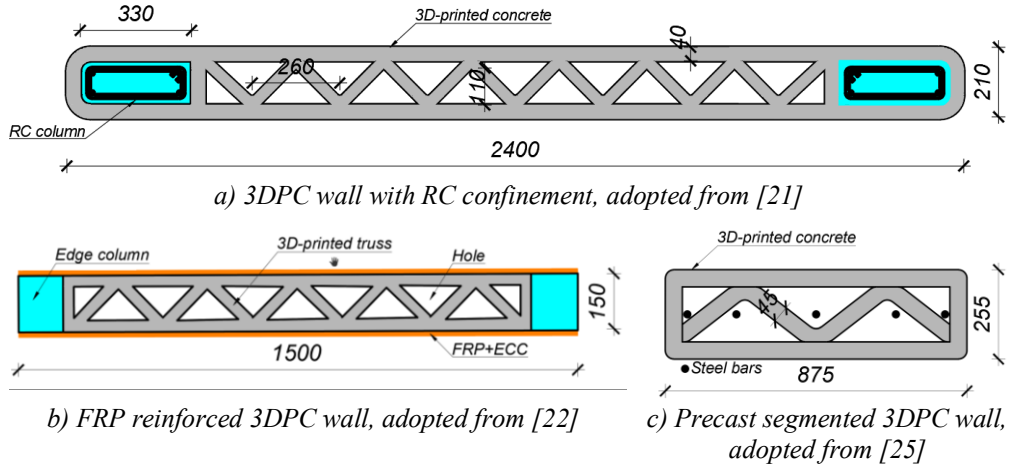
Examples of cross-sections of the reviewed 3DPC wall types
